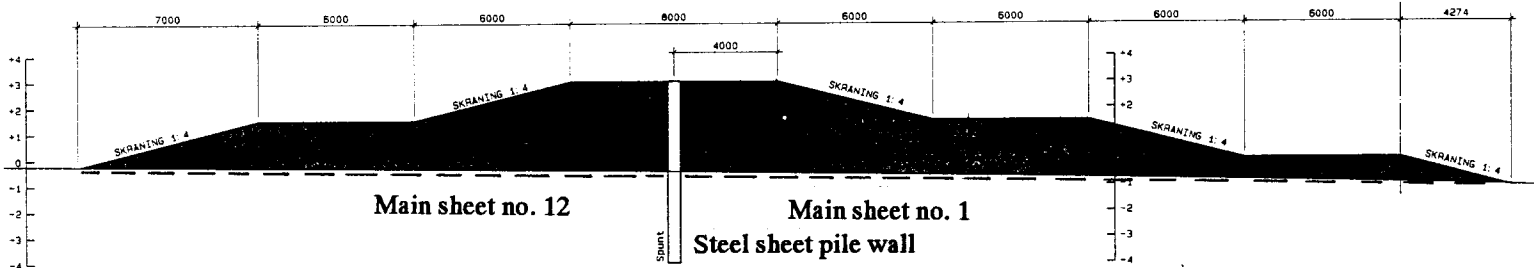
Section of dam fill barrier with steel sheet pile wall for tidal control
